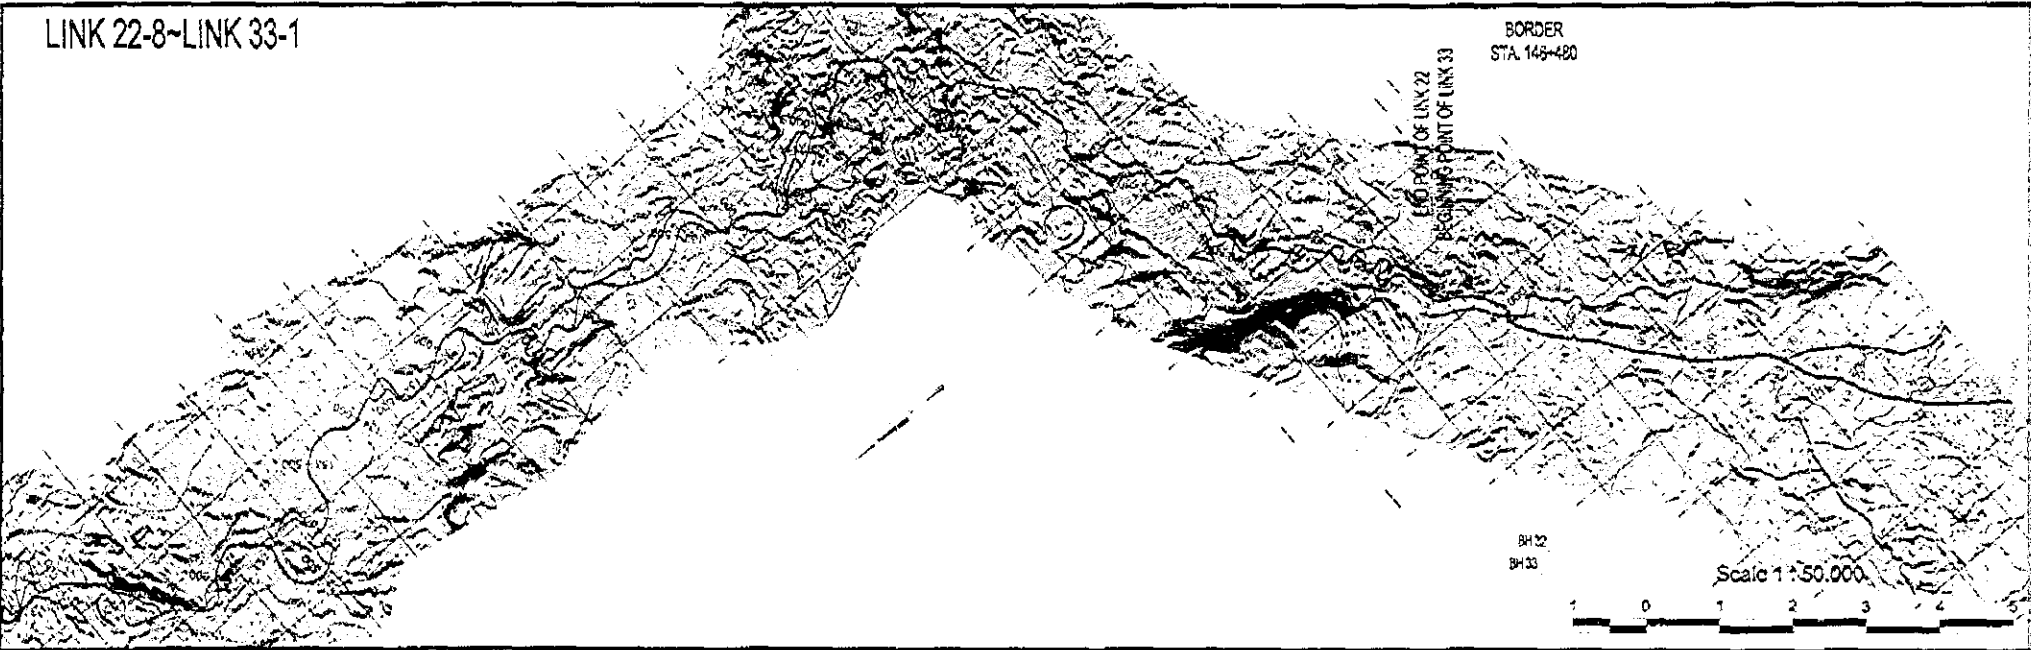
Road Alignment of Umpanga to Sandangpangan (5 of 11)
